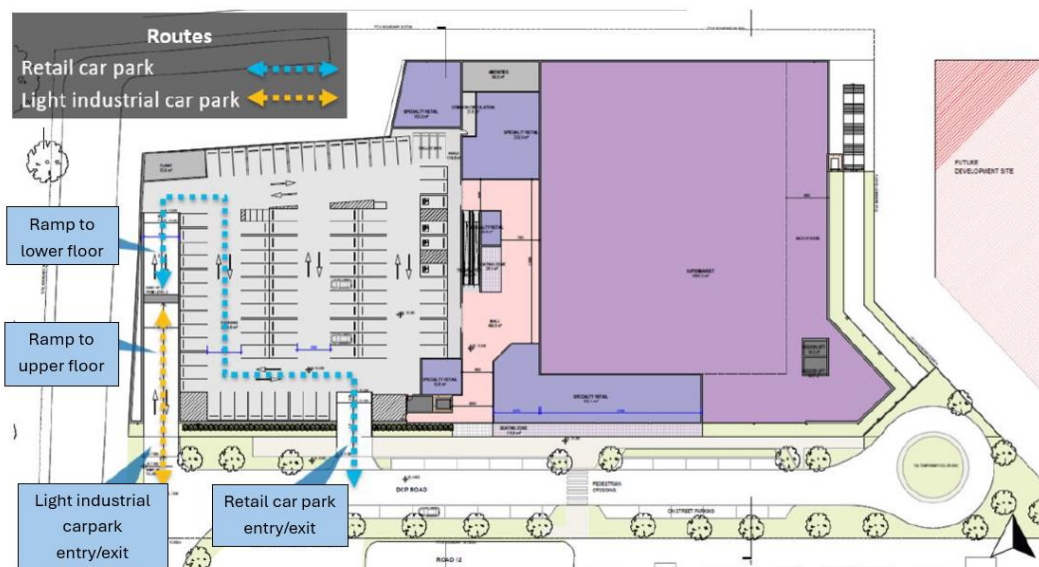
Sprinkler Avenue proposed entry/exit points. Source: Addendum Traffic Impact Assessment Report prepared by EMM Consulting
